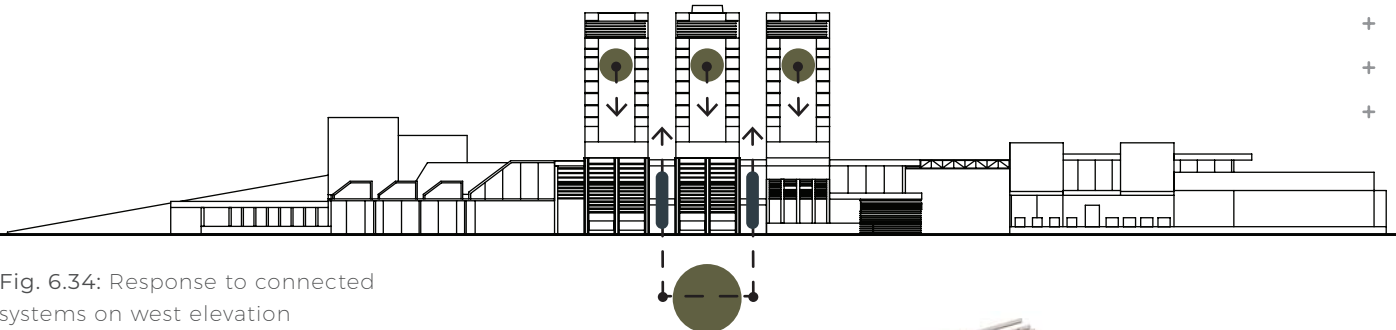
Response to connected systems on west elevation (Author:2018)
